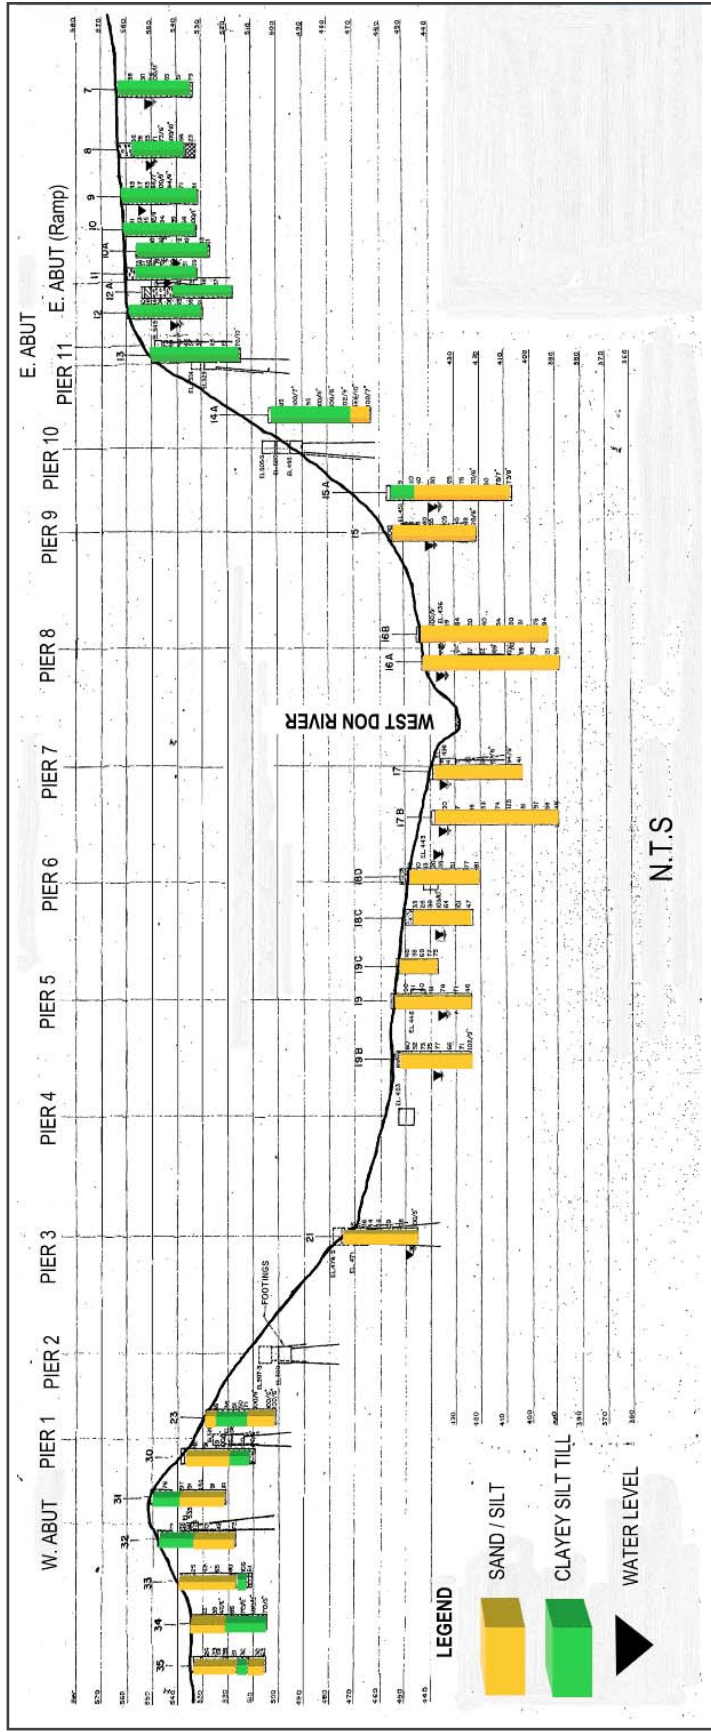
Subsurface Profile along Eastbound Collector Road Bridge (reproduced from Foundation Investigation Report, August 2006)
